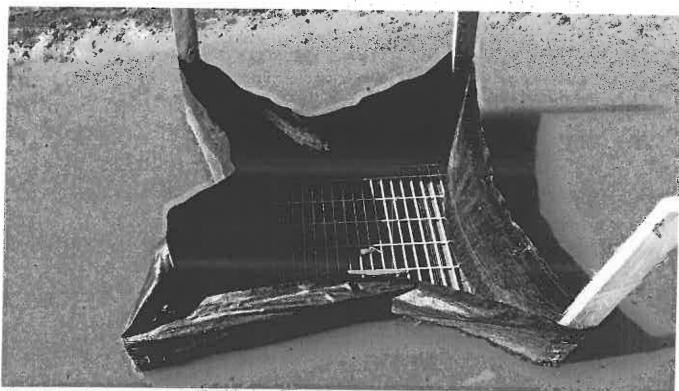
Stormdrain requires Atgrade inlet protection at the new Tennis Court.
